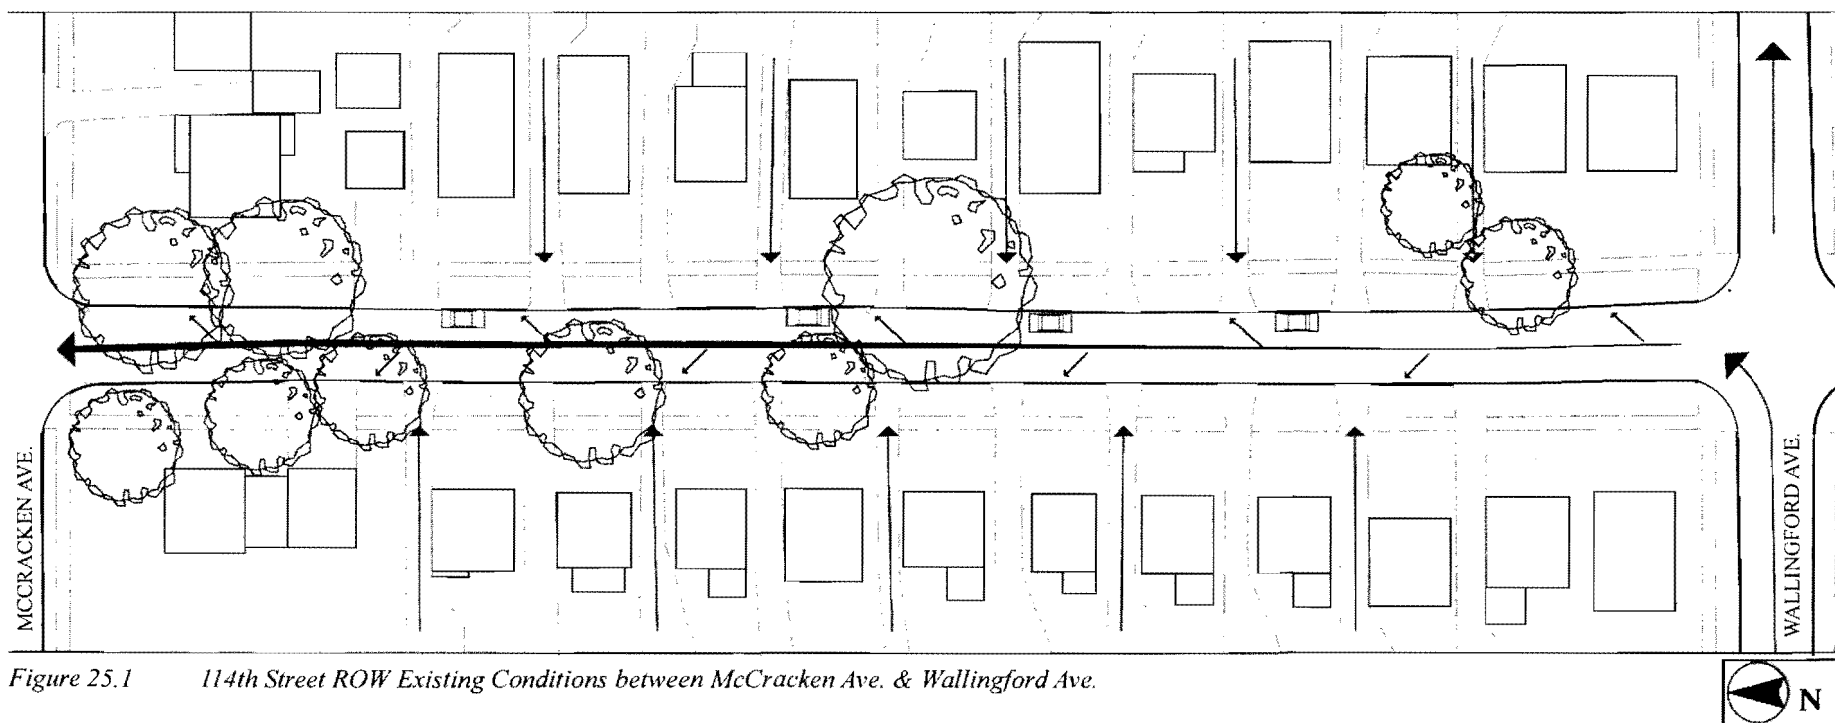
114th Street ROW Existing Conditions between McCracken Ave. & Wallingford Ave.
